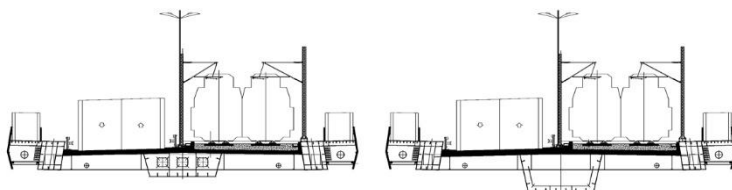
Cross-sections of approach spans 1-2 and 4-5
